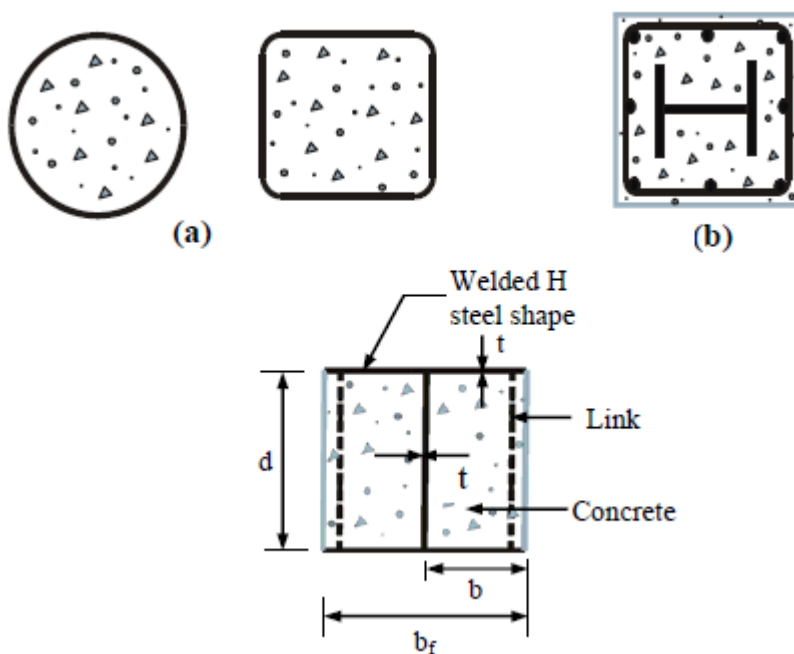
Common types of composite columns, (a) concrete filled tubes; (b) fully encased composite column; and (c) partially encased column
